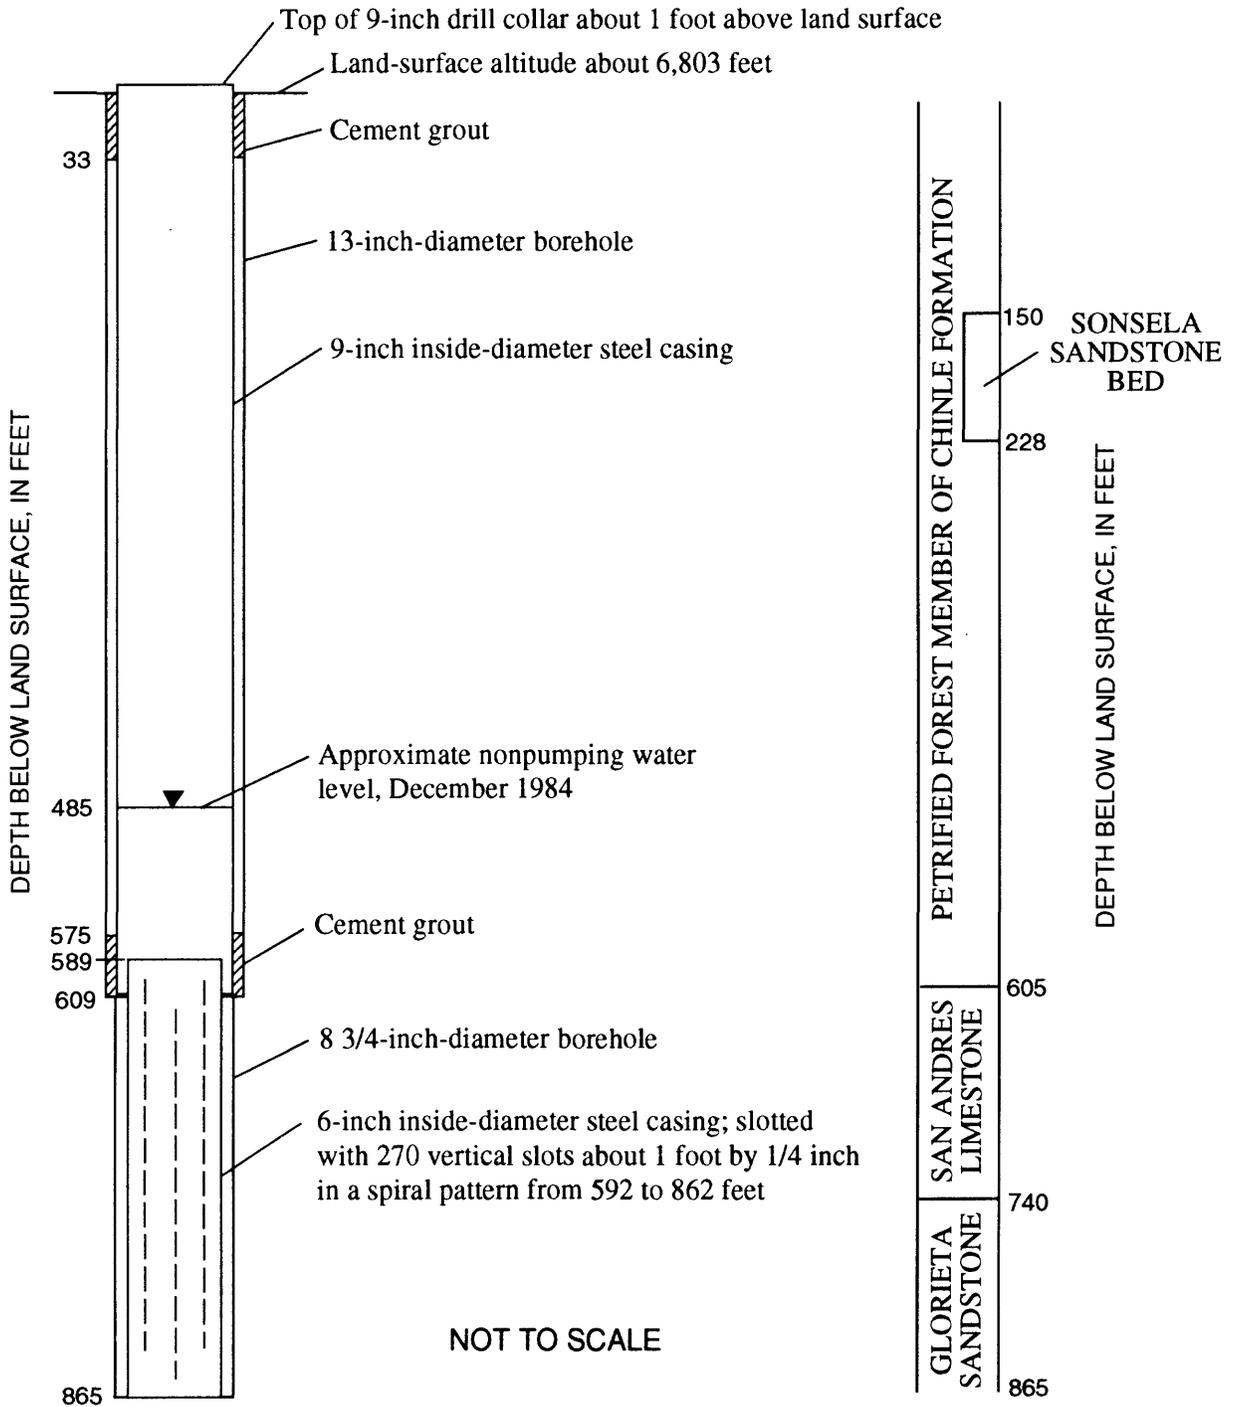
Construction details of San Andres-Glorieta test well ZS-1 and general geologic column.
